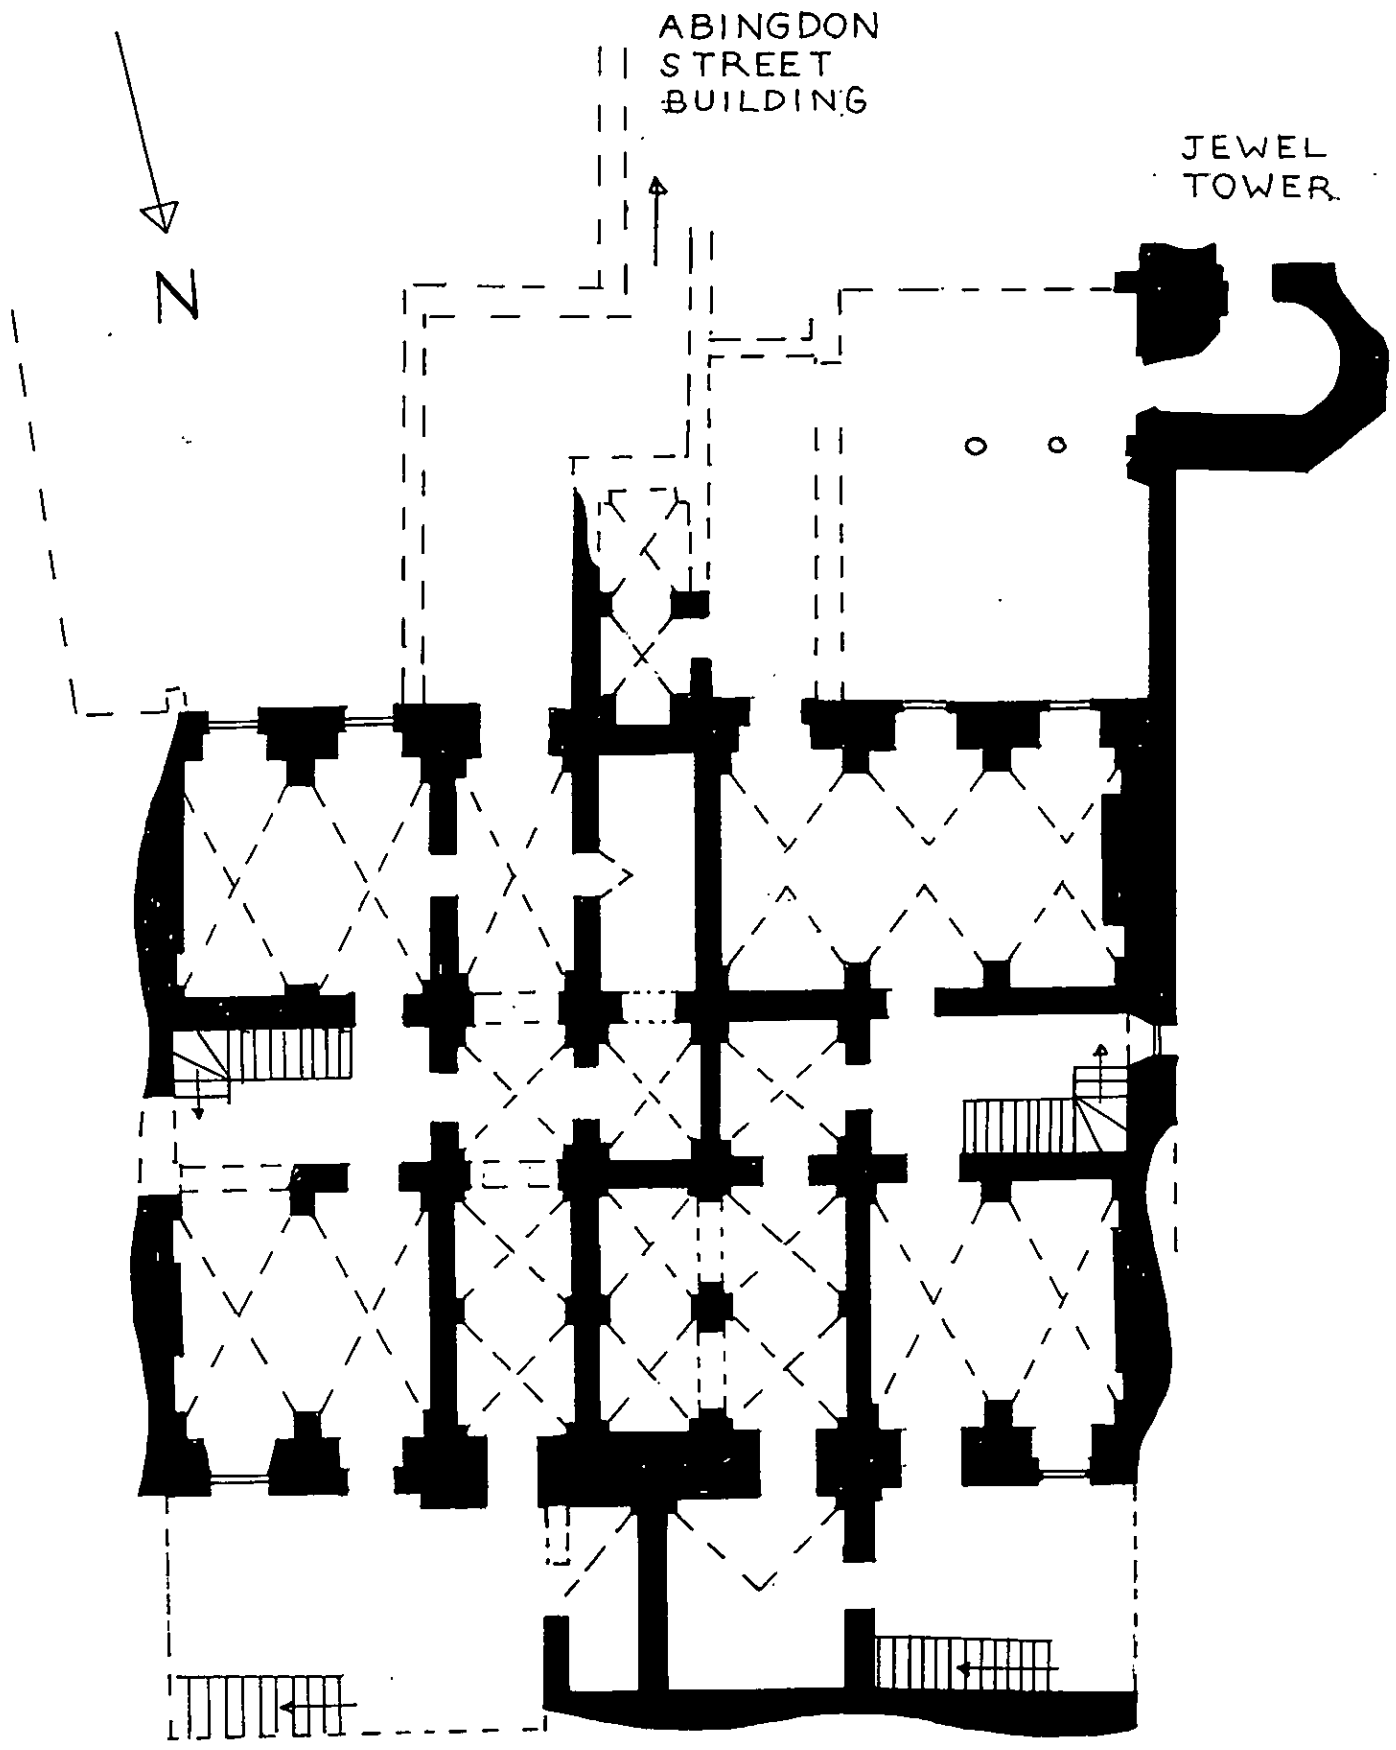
Conjectural reconstruction of the Basement in 1793. Not to scale. (RCHME)
